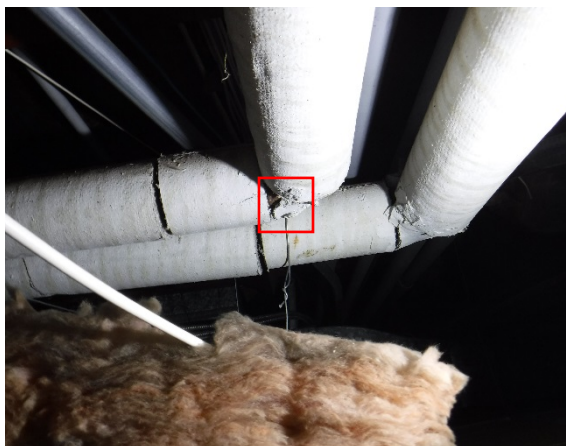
Photo of sample AS-09, Hallway (Main) – Piping Insulation, Fitting, 65% Chrysotile Asbestos.
